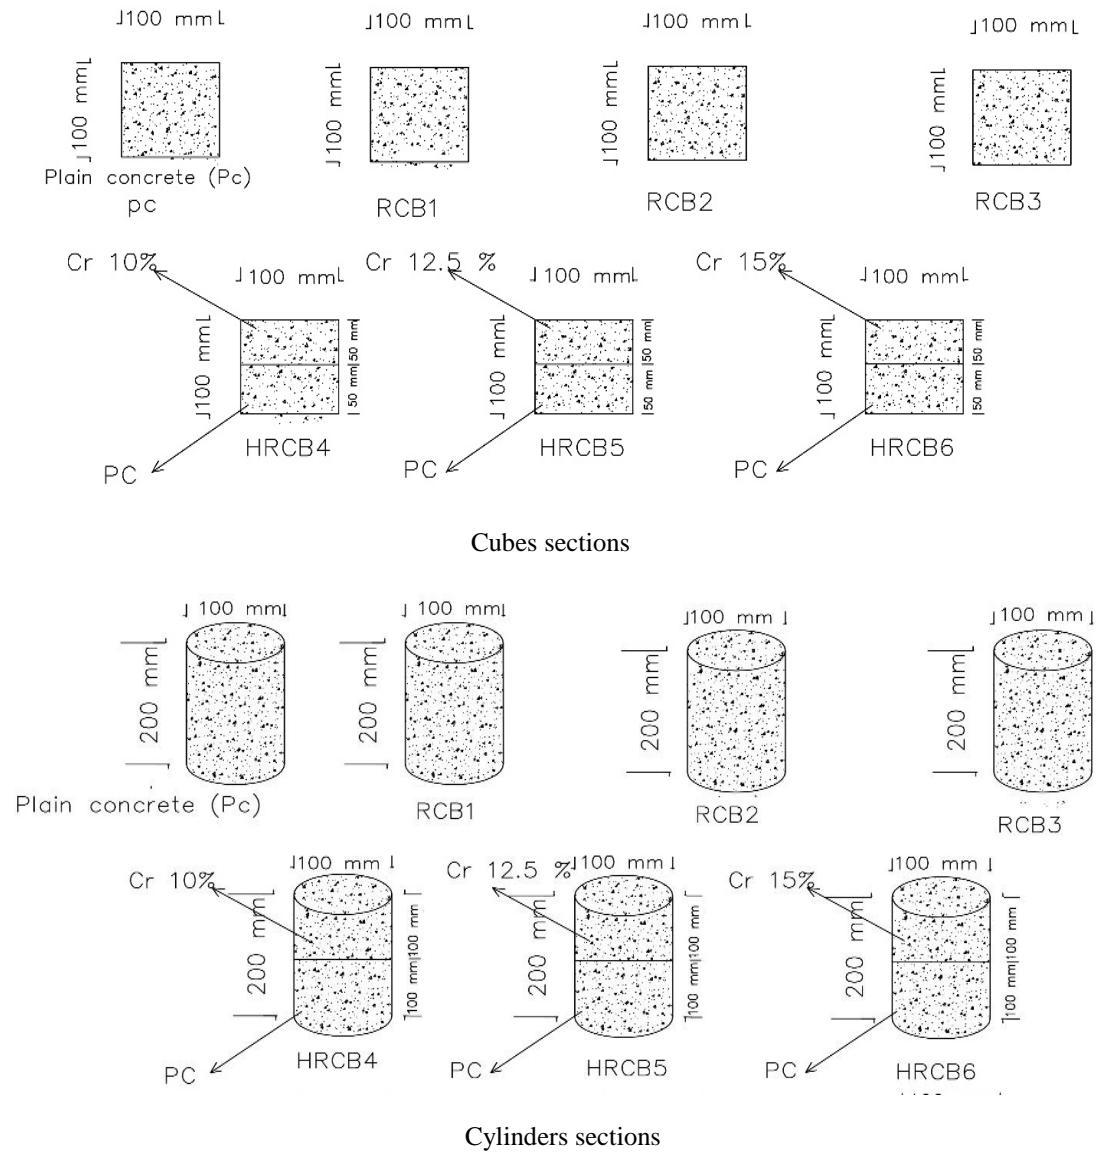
Details of Rubberized and Hybrid Rubberized Concrete
